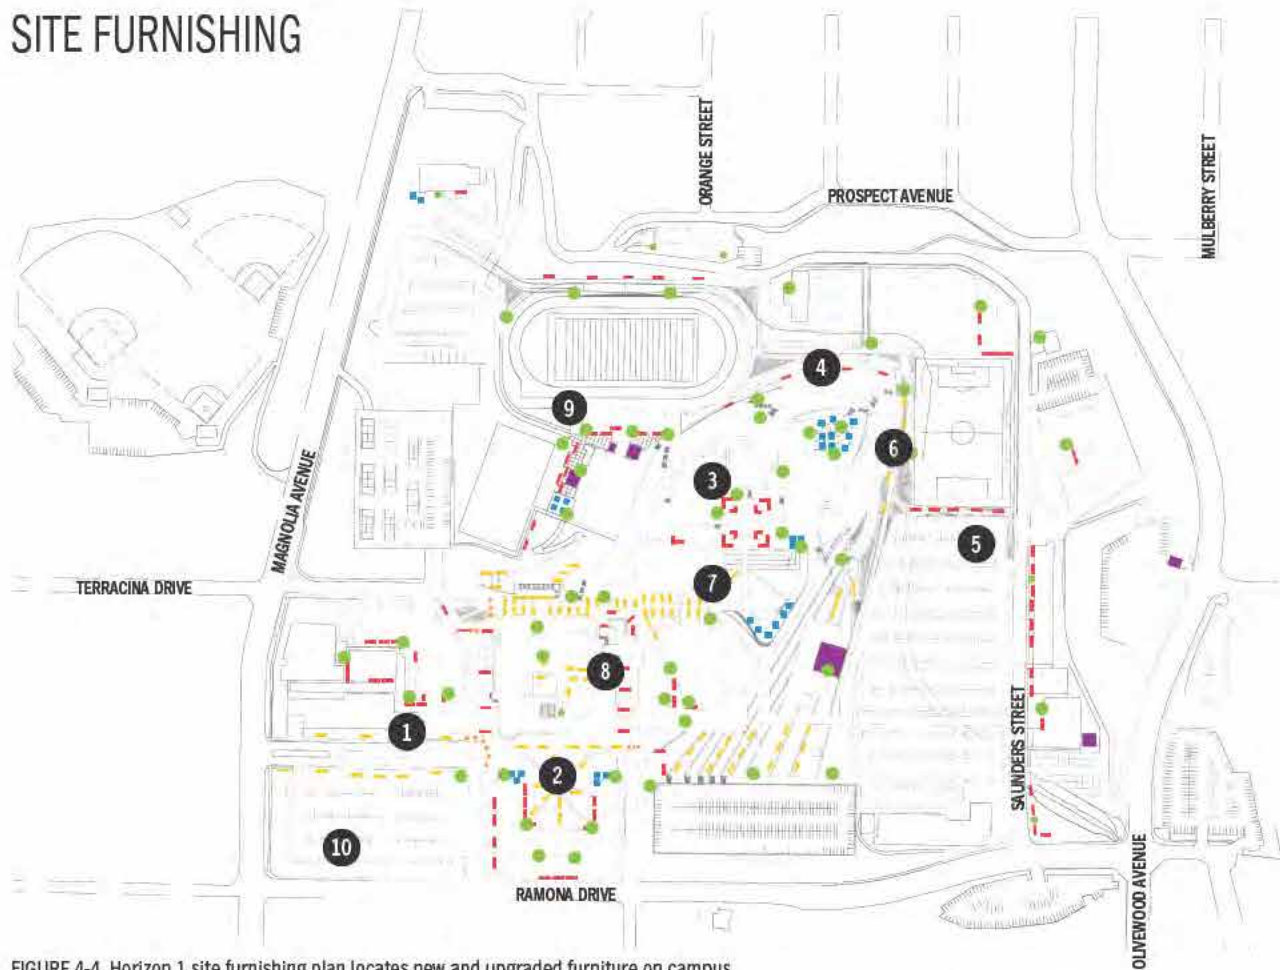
Horizon 1 site furnishing plan locates new and upgraded furniture on campus
